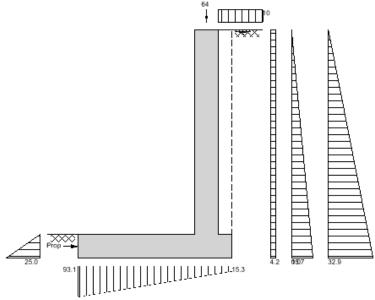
RC Retaining wall 1 stresses - permanent conditions
